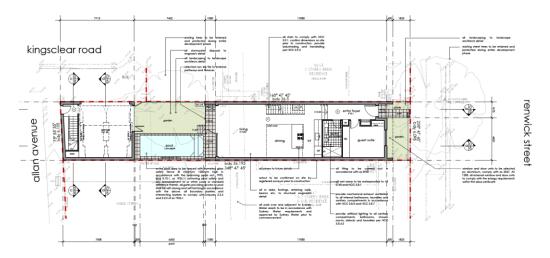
Proposed ground floor plan demonstrating the internal void above the kitchen/ dining area
